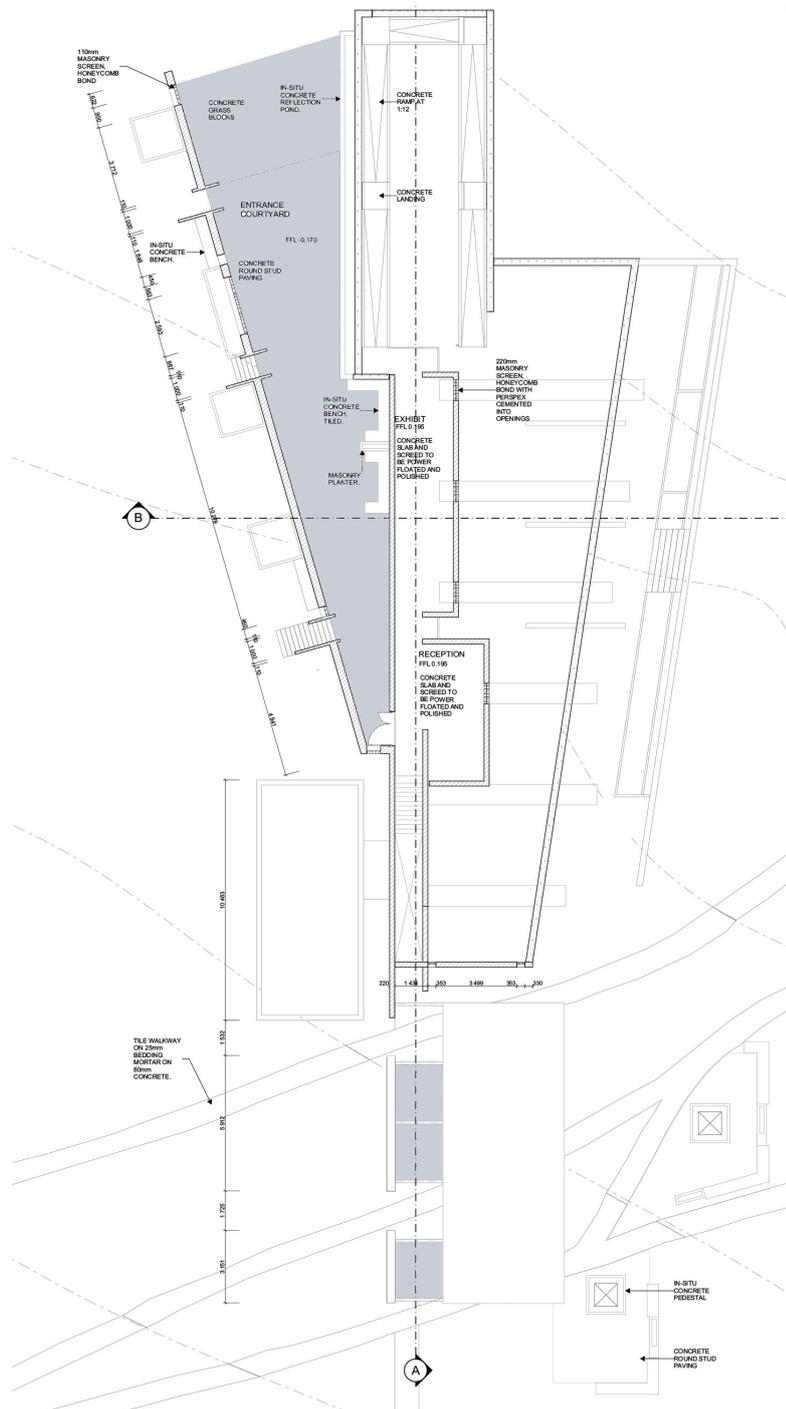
Outdoor spaces shaded by North-South wall (author).
